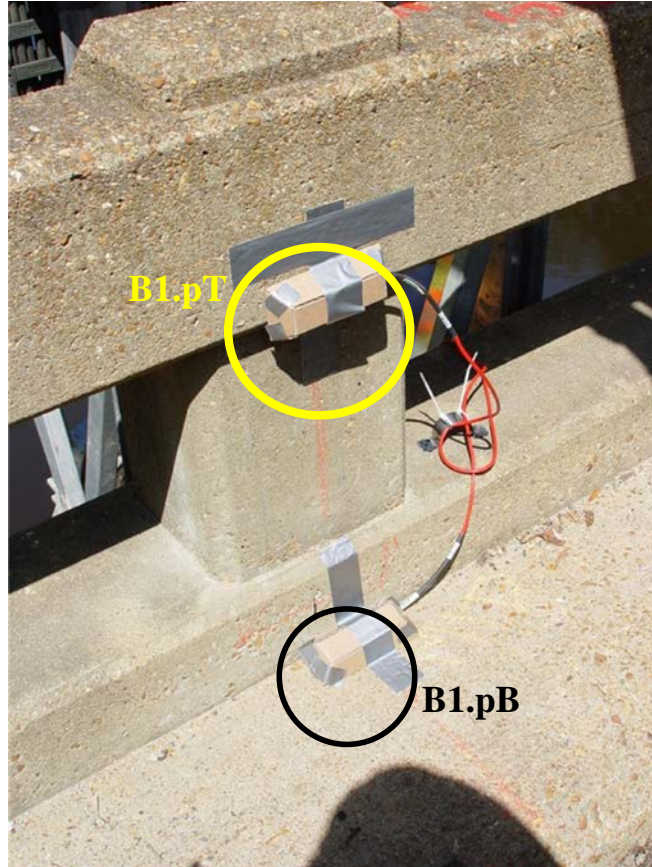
Strain Gauge Locations on Parapet of Adkins Road Bridge
